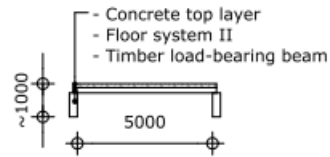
Cross-section A-A of the prefabricated timber floor system II plus a concrete top layer in mm
